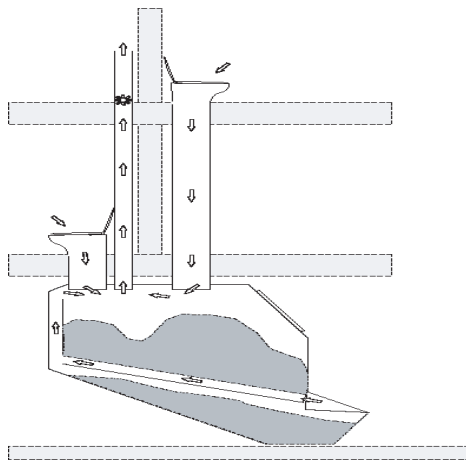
Side view of a house with two toilets on two floors and one composting container in the basement, with removal compartment at bottom right (source: Berger Biotechnik).
